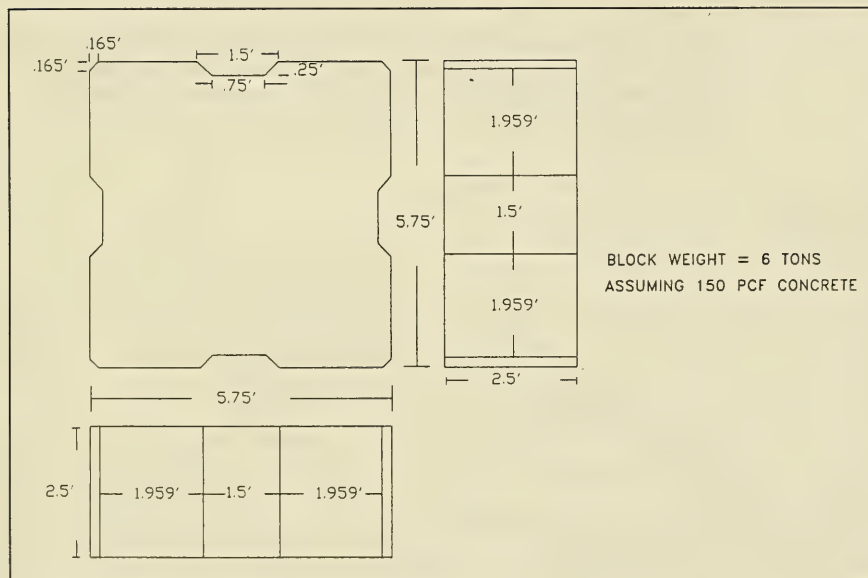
Details of optimized concrete block used on Plans 7, 7R, 8, 8R, 9, and 9R
